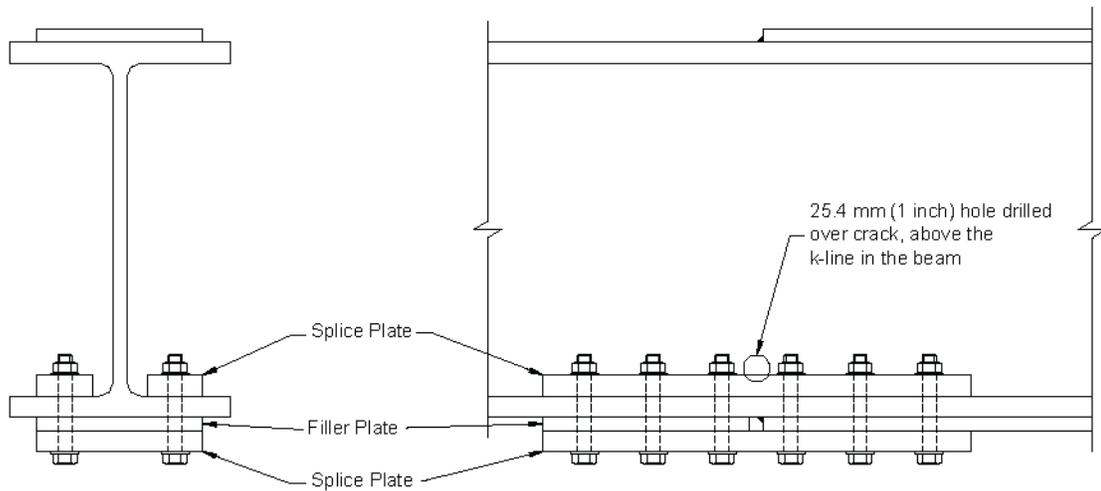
Detailing of splice plate retrofit for cracked coverplate details.
